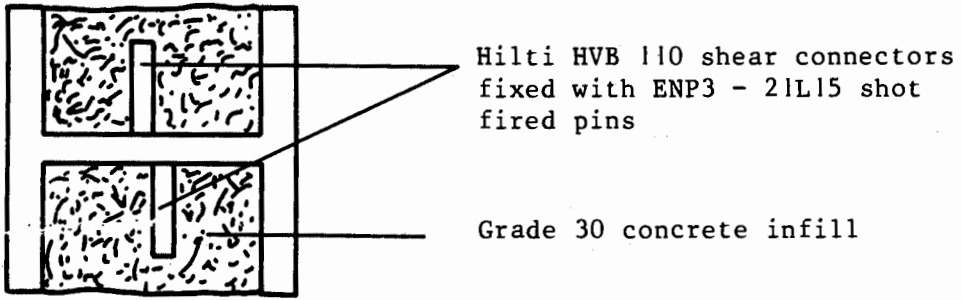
DETAILS OF HILTI SHEAR CONNECTOR LOCATIONS AND CONCRETE INFILL - TEST NO. TE 7382
